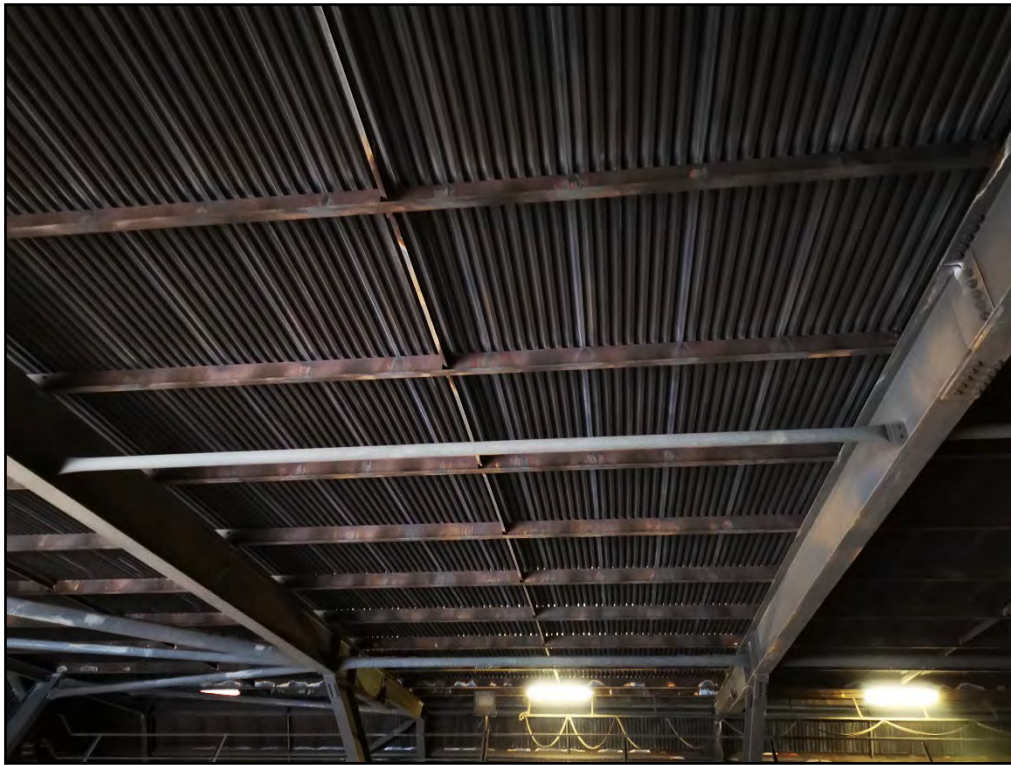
Surface Corrosion of Purlin with Product Deposit
